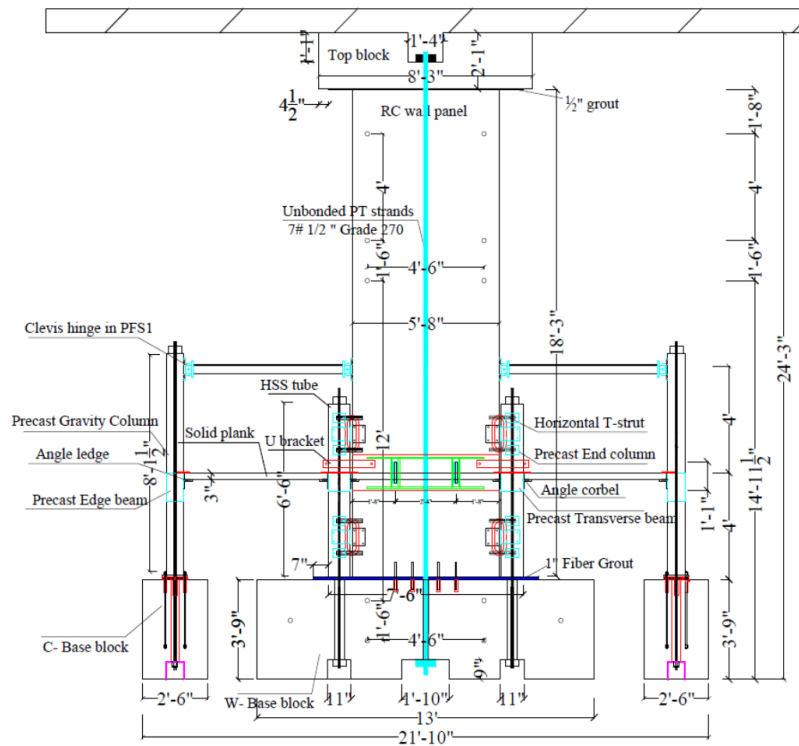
Elevation view of specimen PFS2 (Liu 2016).
